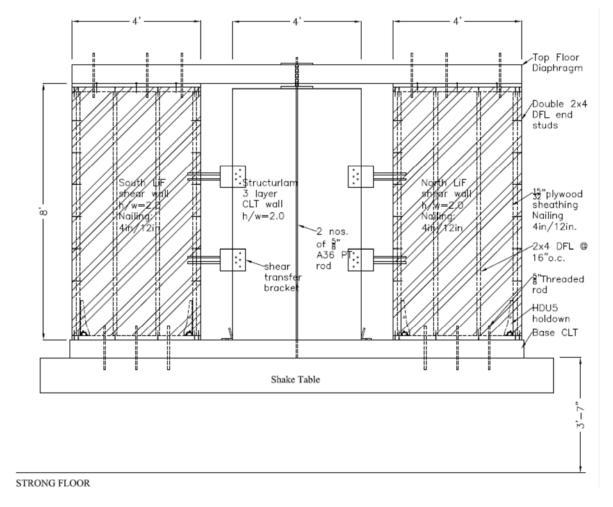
Elevation drawing of CLT-LiFS shearwall assembly
